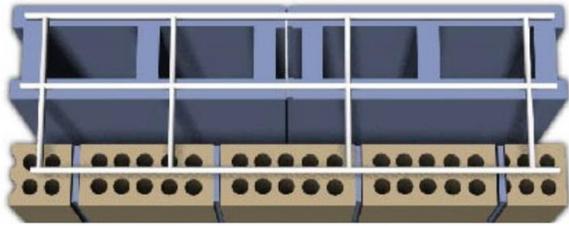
Wall Type 1- Ladder Type Wire Reinforcement
